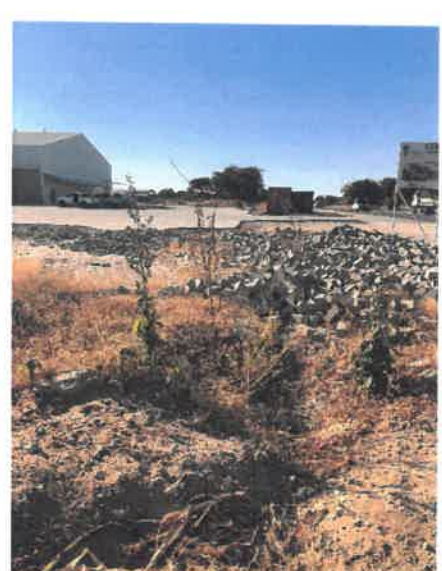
Left-Main road leading to Rundu CBD adjacent the site
